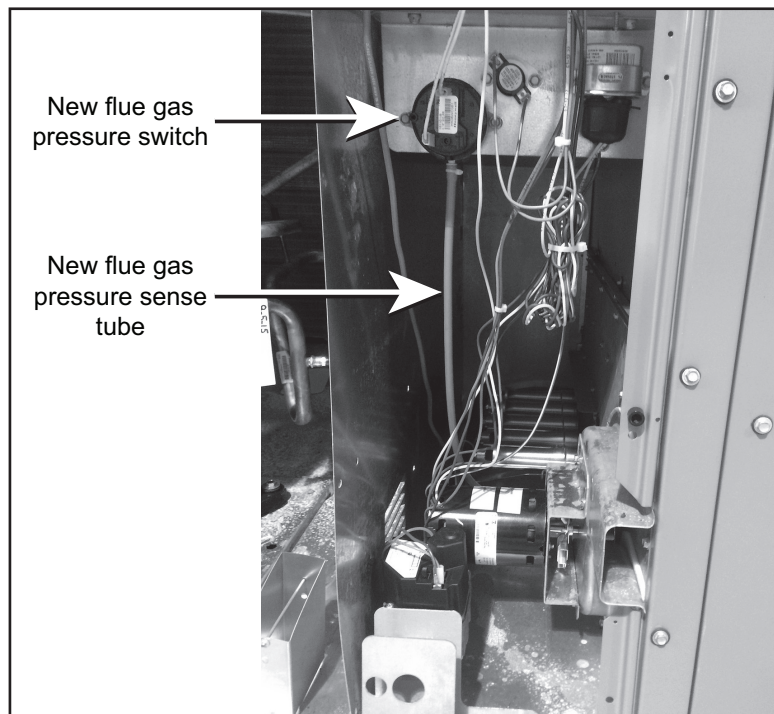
Flue Gas Pressure Switch and Pressure Sense Tube - Typical Location
